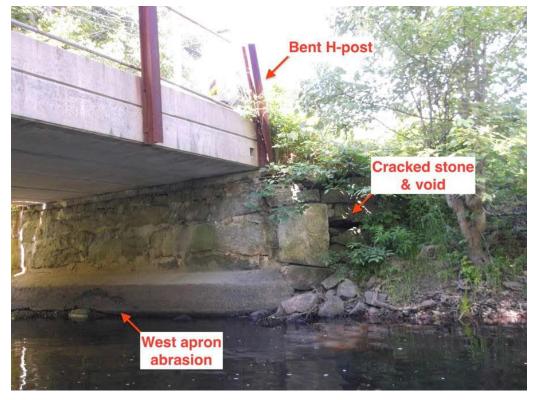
Bent North rail post, Northwest wingwall void, and West apron abrasion.
